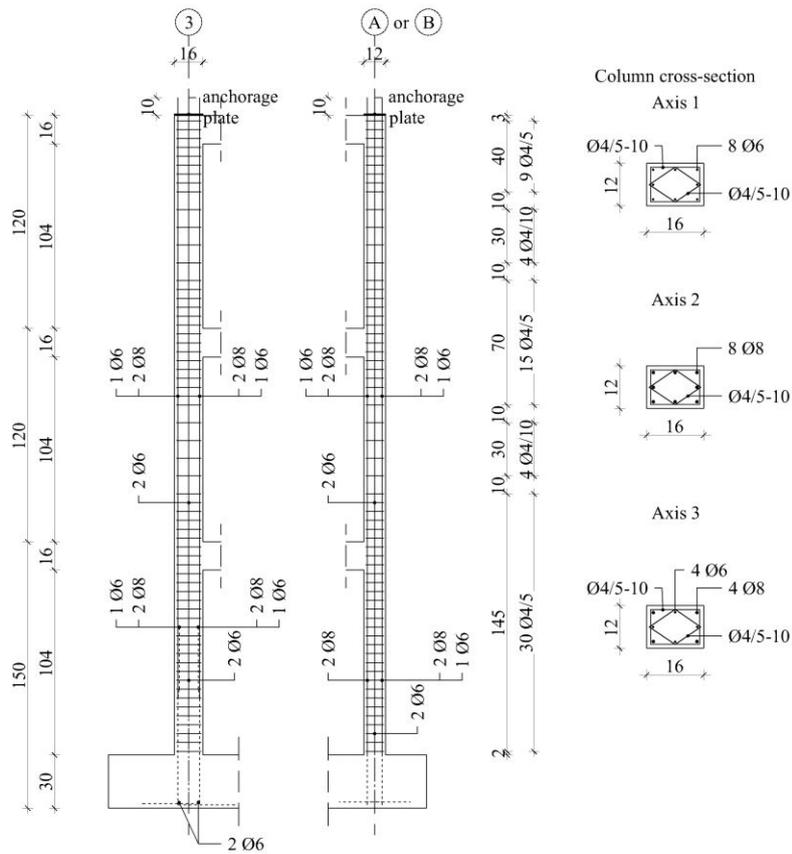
Column reinforcement details (units in cm except for bar sizes)
